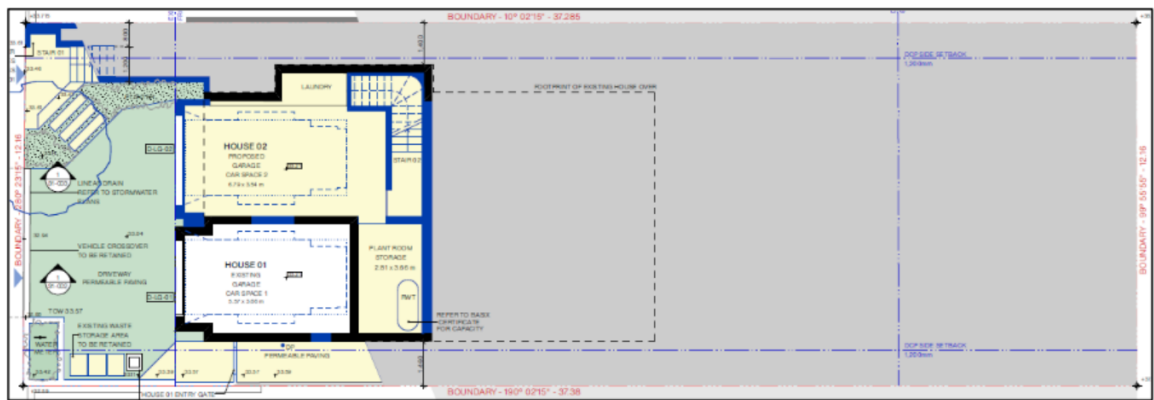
Lower Ground Floor Plan - 10 Moore Street (Source: Tribe Studios)
